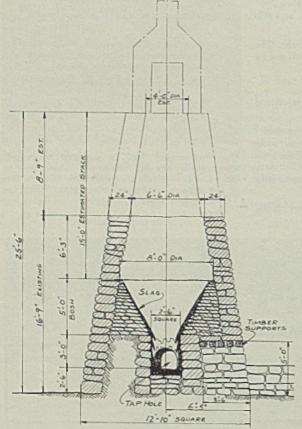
Section through stack showing the location of timber which was employed for the supporting arch over the tuyere chamber
